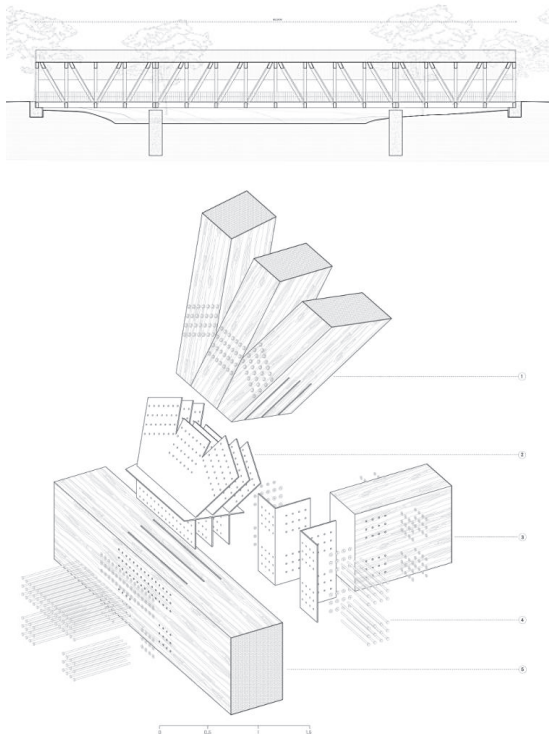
Elevation view of bridge and isometric view of connection detail - Oliver Cooper White, William Johnson, Yarden Lavy, Tim Window
